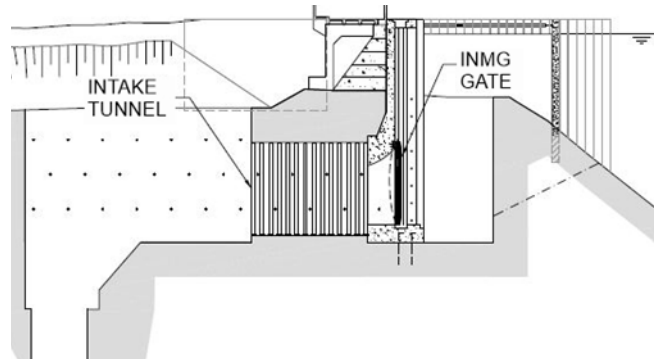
Completion of the intake tunnel and upper bend shaft excavation.
